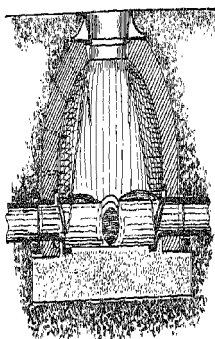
DETAILS OF CIRCULAR MANHOLES ON PIPE SEWERS
